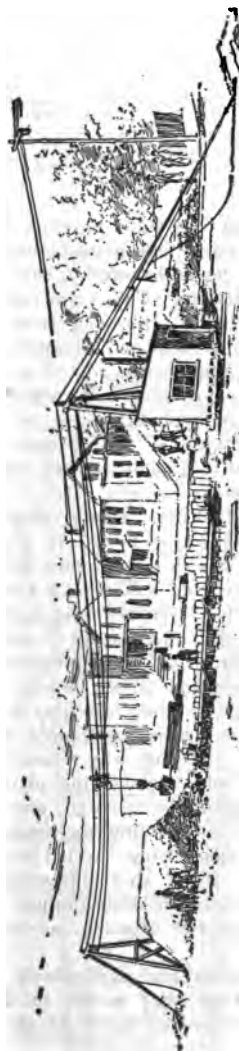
Sketch of Cableway in Use in Orange, N. J., One of the First to Be Installed upon a Sewer Trench.
